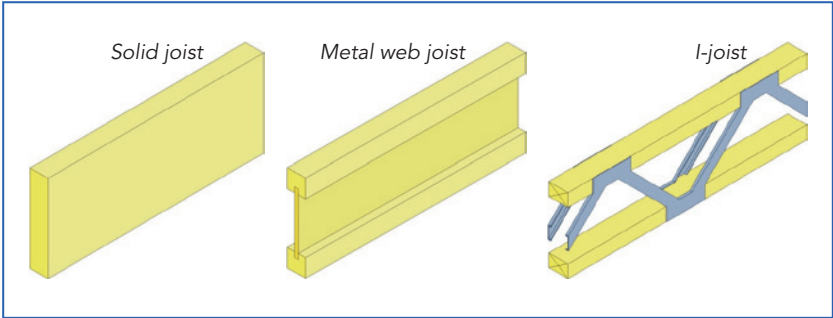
Examples of separating floor joists [[2] - (U.K)].
